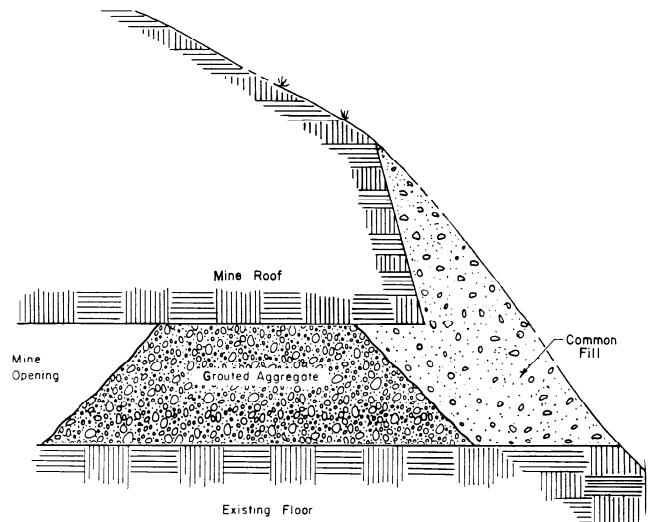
Hydraulic seal of an adit or drift using gunite (Anon., 1973).
